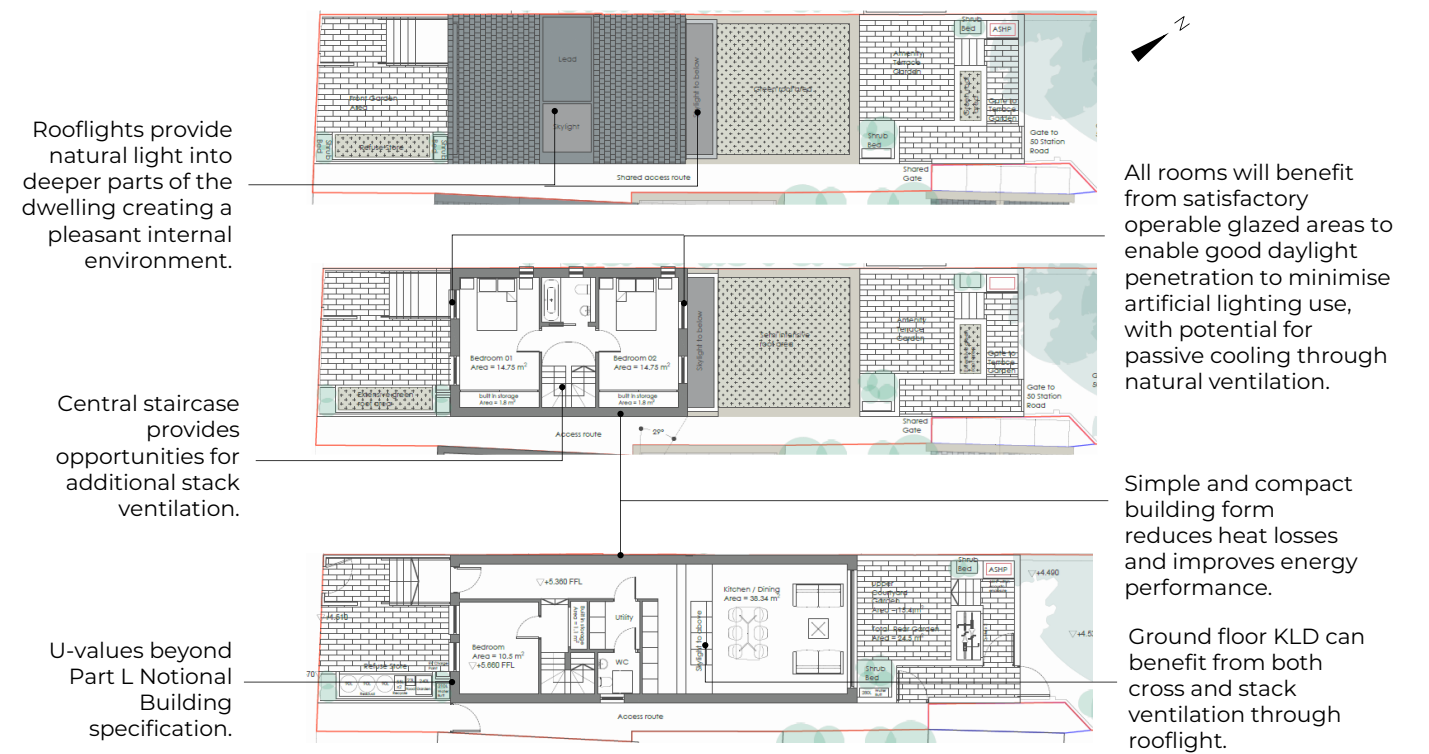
Passive design measures considered for the proposed development. Ground floor (bottom), first floor (middle) and roof plan (top).
